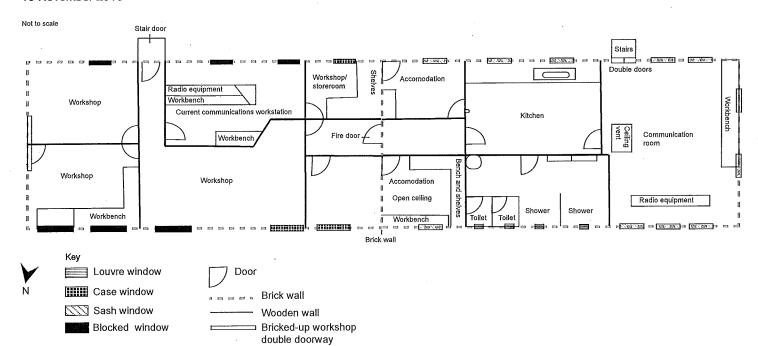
ACMA Facility, Birkdale Main Building 1946 plan. (Source: ACMA: 90/5037/02 QR 1/2/8A/2).
